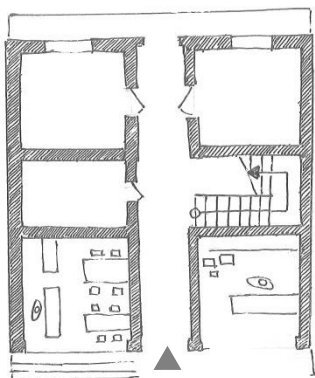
Typical plan of building (Shock Safe Nepal group 1).
